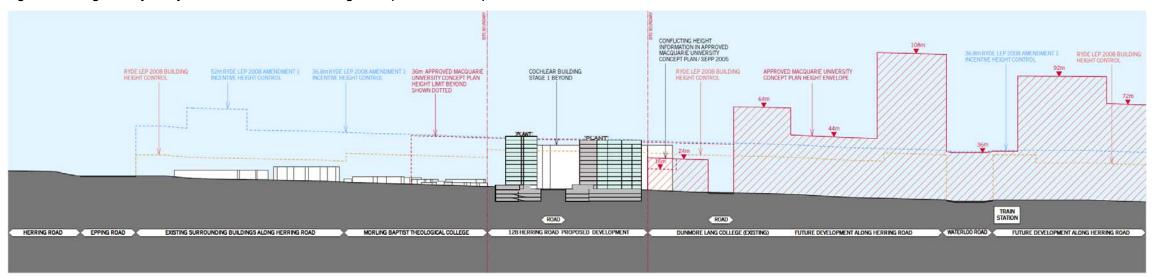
Height Study Analysis Section Parallel to Proposed New Boulevard (southern section)
